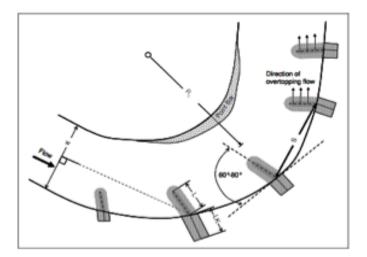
Bendway Weir Plan View (Lagasse et al., 2009b).
